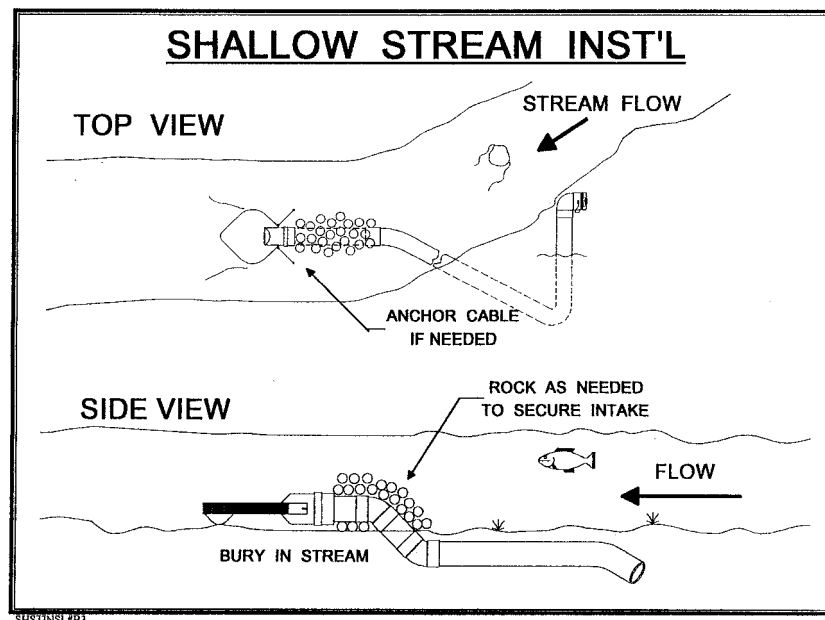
DRY HYDRANT CONSTRUCTION EXAMPLE (EMNRD, N.D.)
